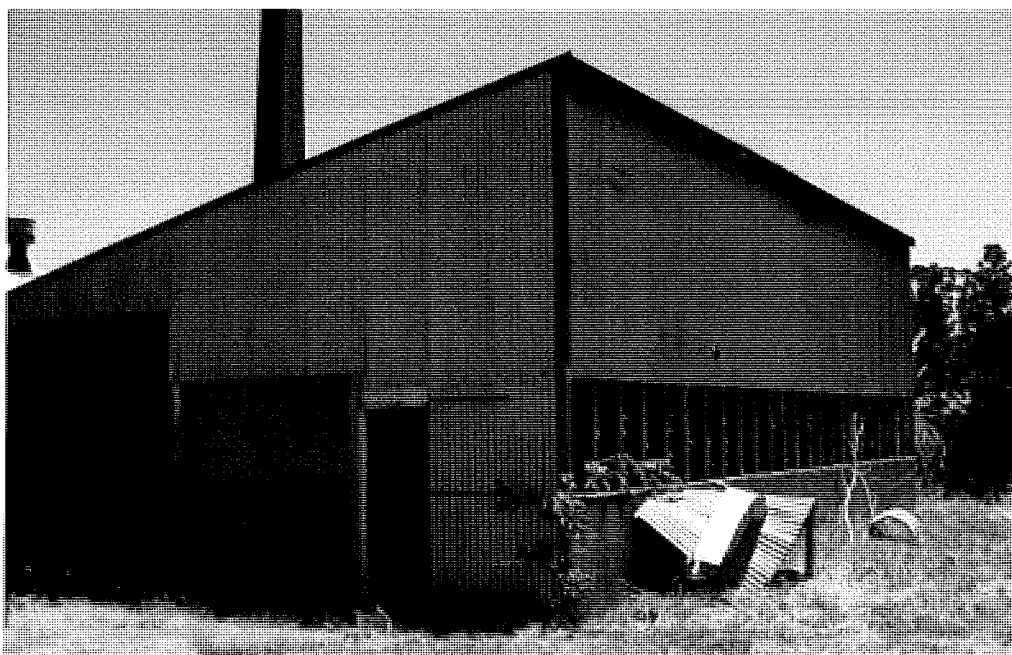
Exterior, showing the south and east elevations. The brick wall is an earlier element incorporated into the workshop building.
